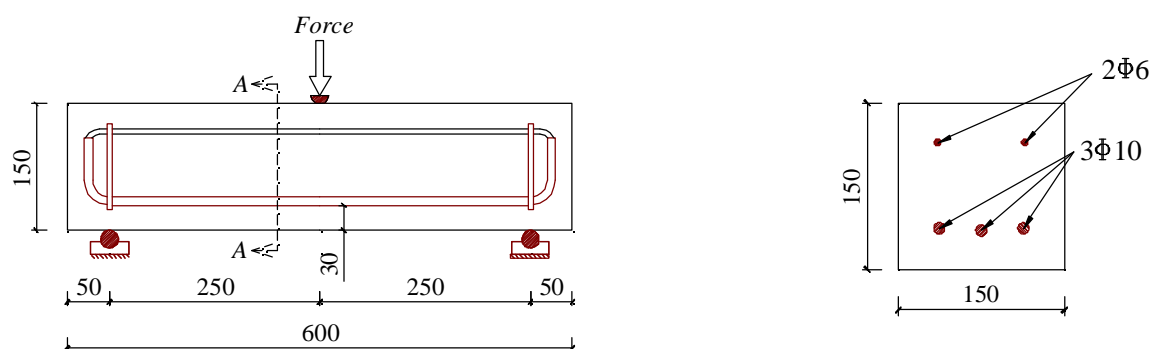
Geometry and reinforcement arrangements of concrete beams (dimensions in mm)
